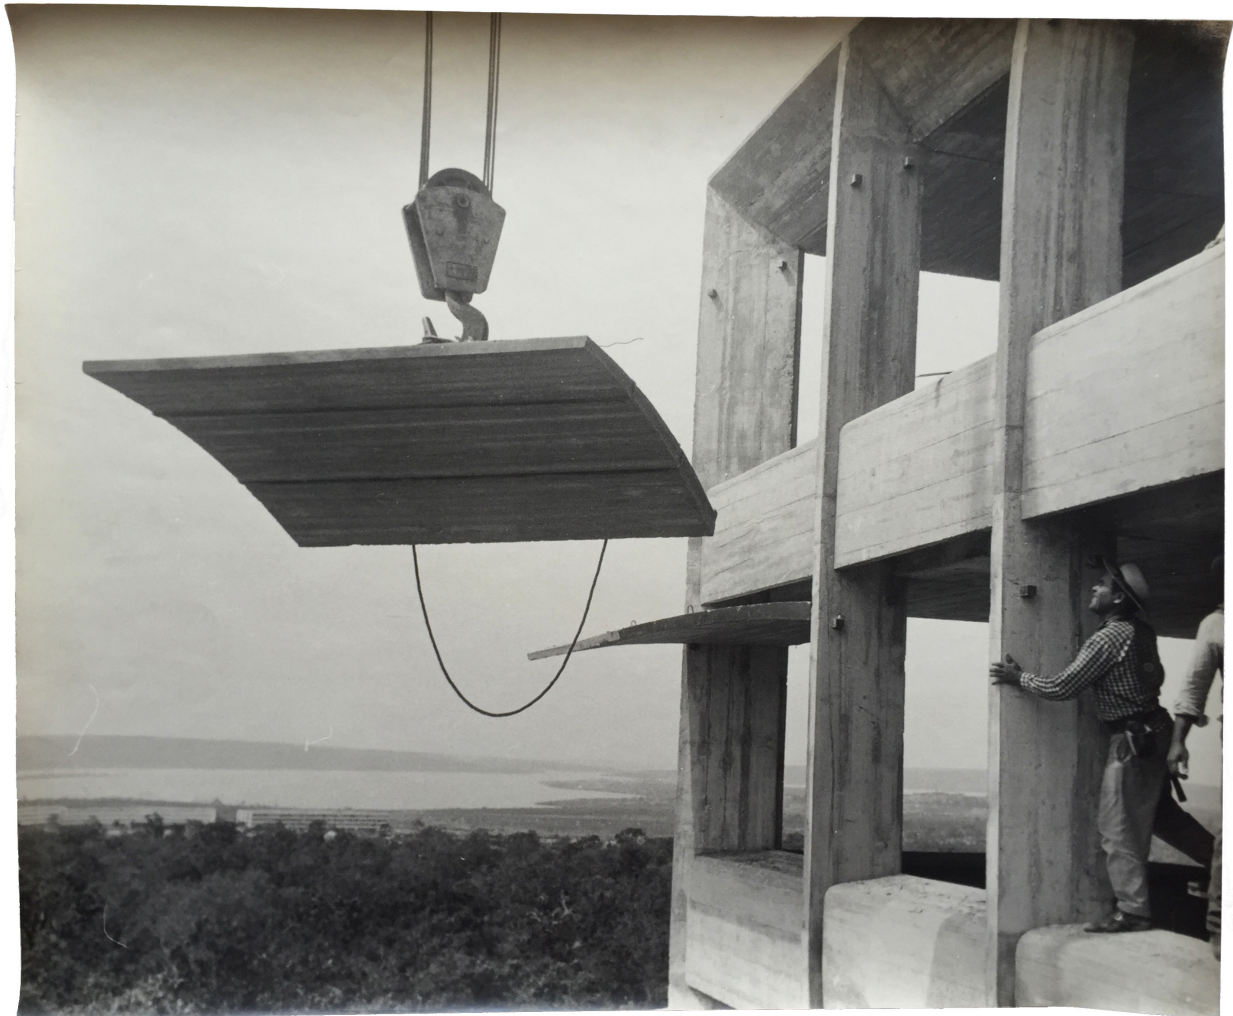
Brise-soleil assembling process, Disbrave building. João Filgueiras Lima, 1965. Photograph by Marcel Gautherot. Arquivo João Filgueiras Lima, Salvador
